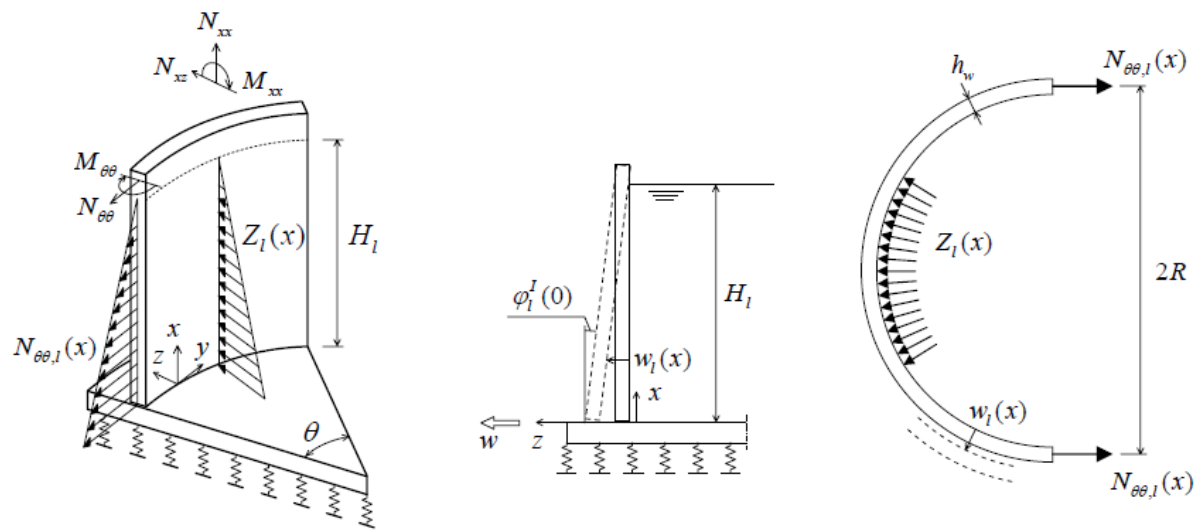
Load direction and deformation of a cylindrical wall subjected to internal load (R. Braam, 2010)
